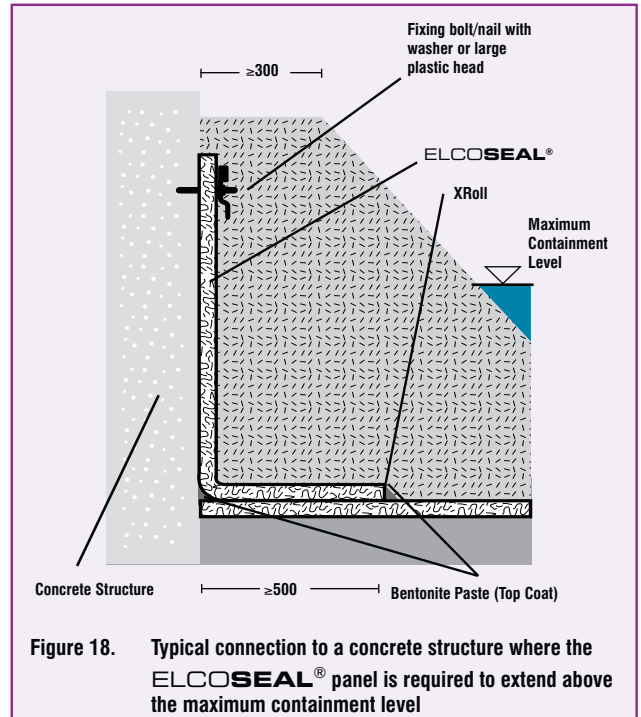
Typical connection to a concrete structure where the ELCOSEAL® panel is required to extend above the maximum containment level
